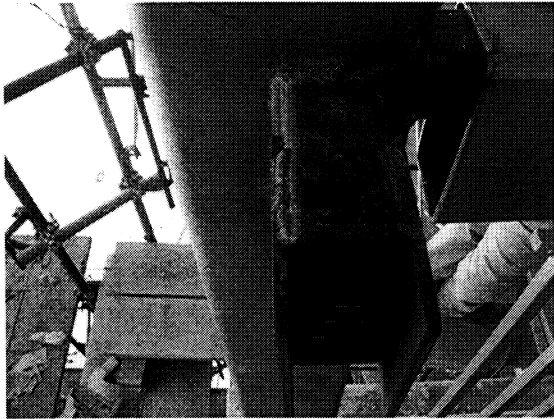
3/16" flat plates welded to 2"x2" stub
